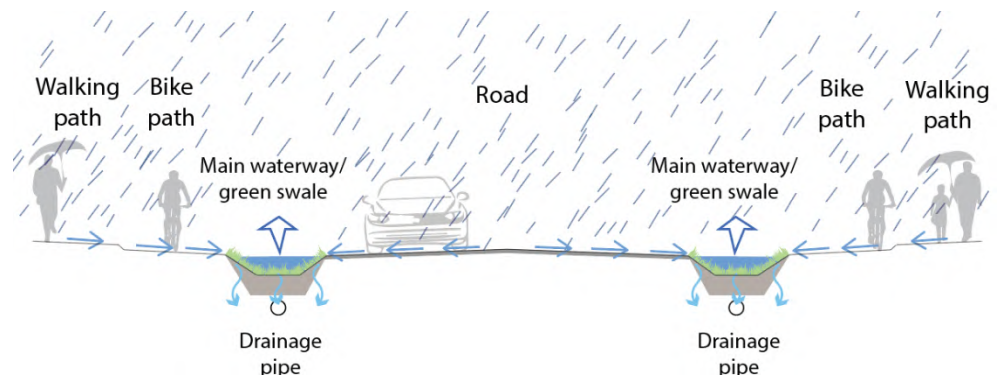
Elevation's hierarchy for road system to safeguard sustainable stormwater management and ensure floodways.
